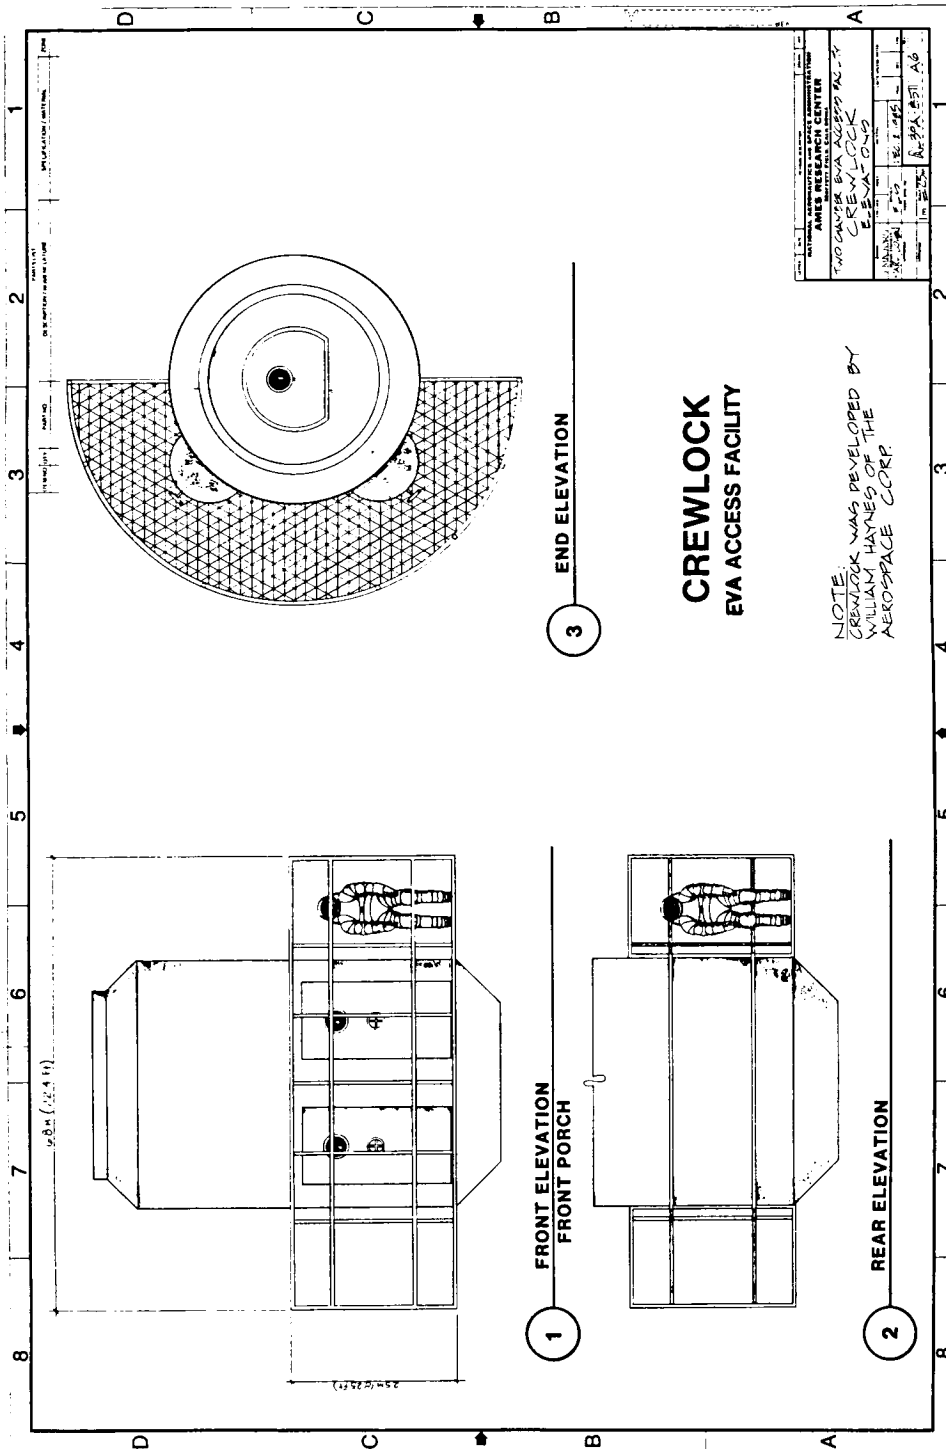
Crewlock EVA access facility, concept detail showing "front porch" in external views.
